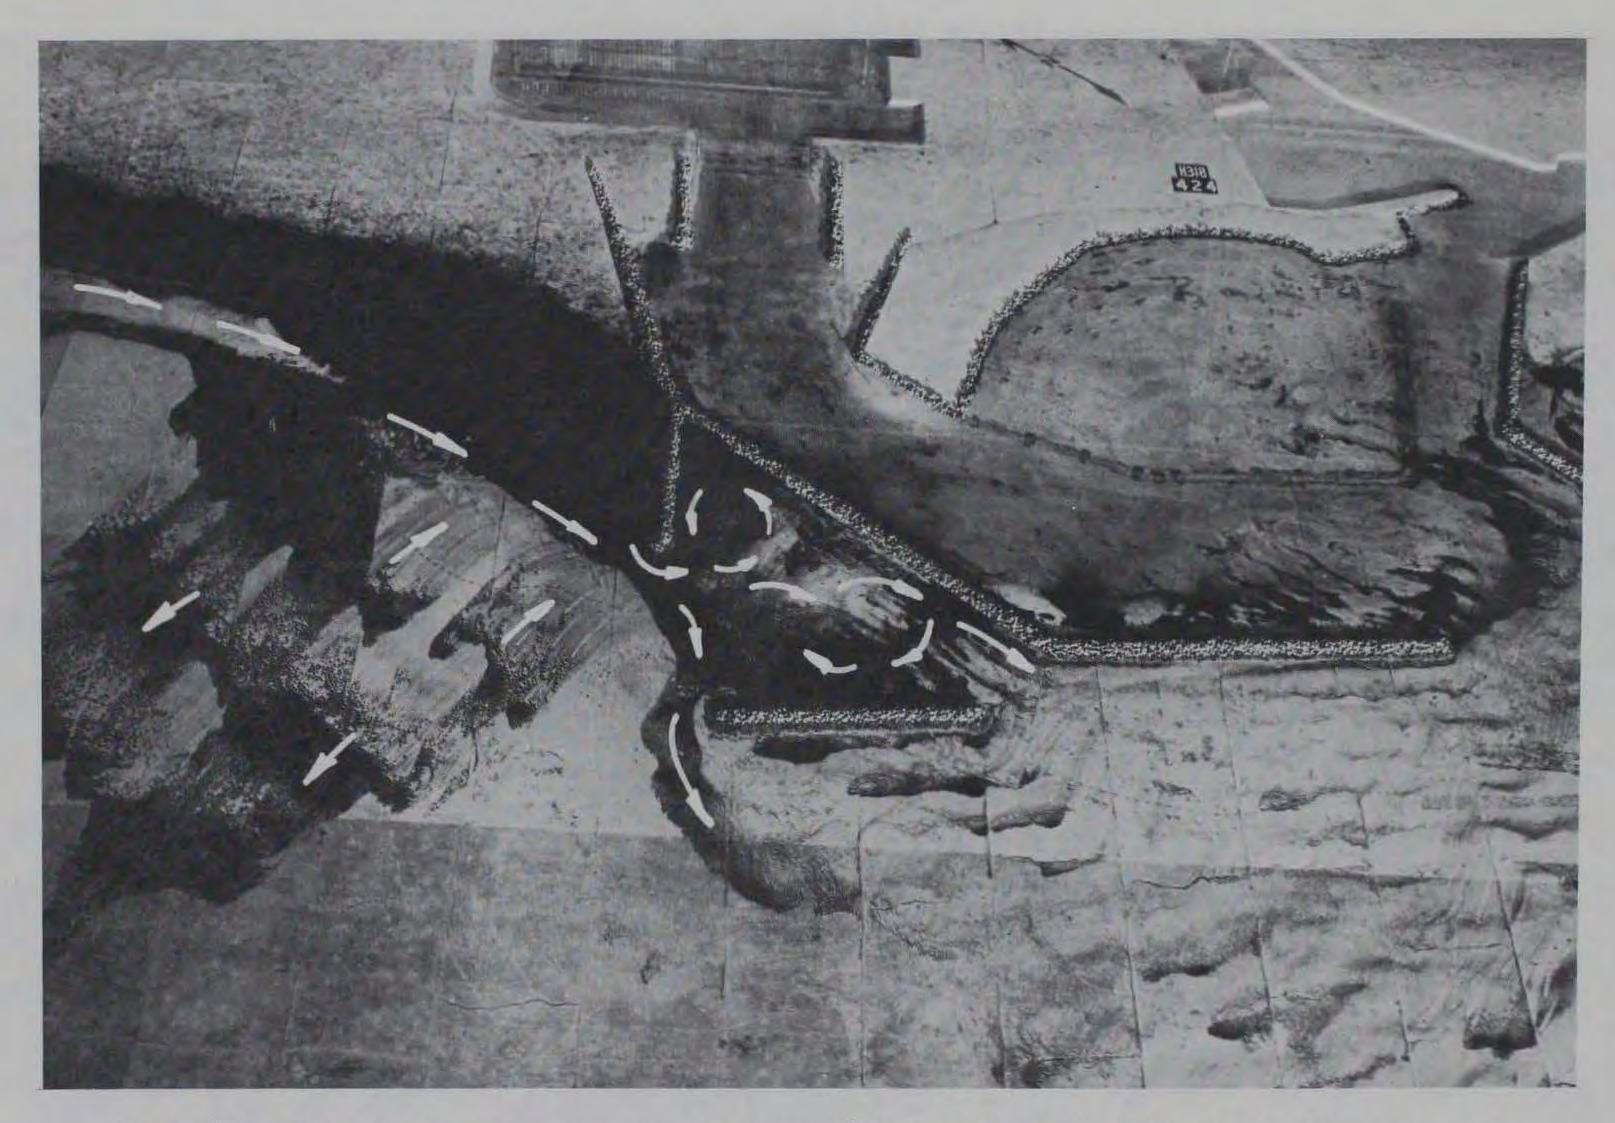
Typical tracer movement for Plan 38C resulting from 7-sec, 10-ft waves from northwest at mllw (without waves)
